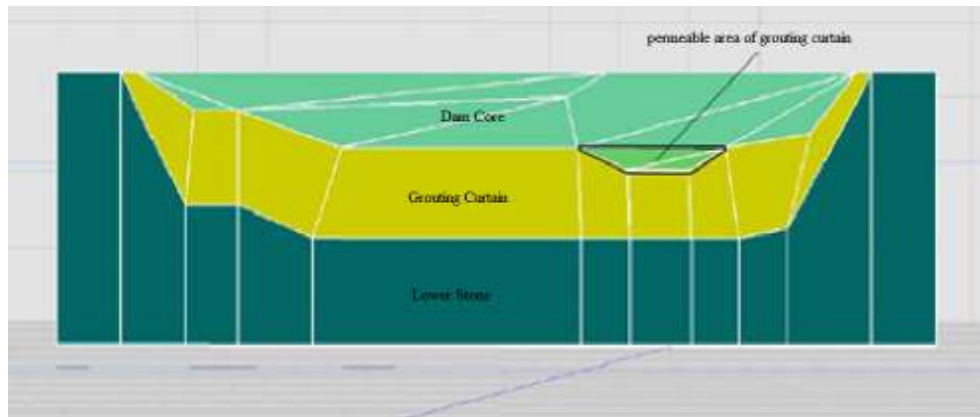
Longitudinal Cross Section of the dam and Grouting Curtain
